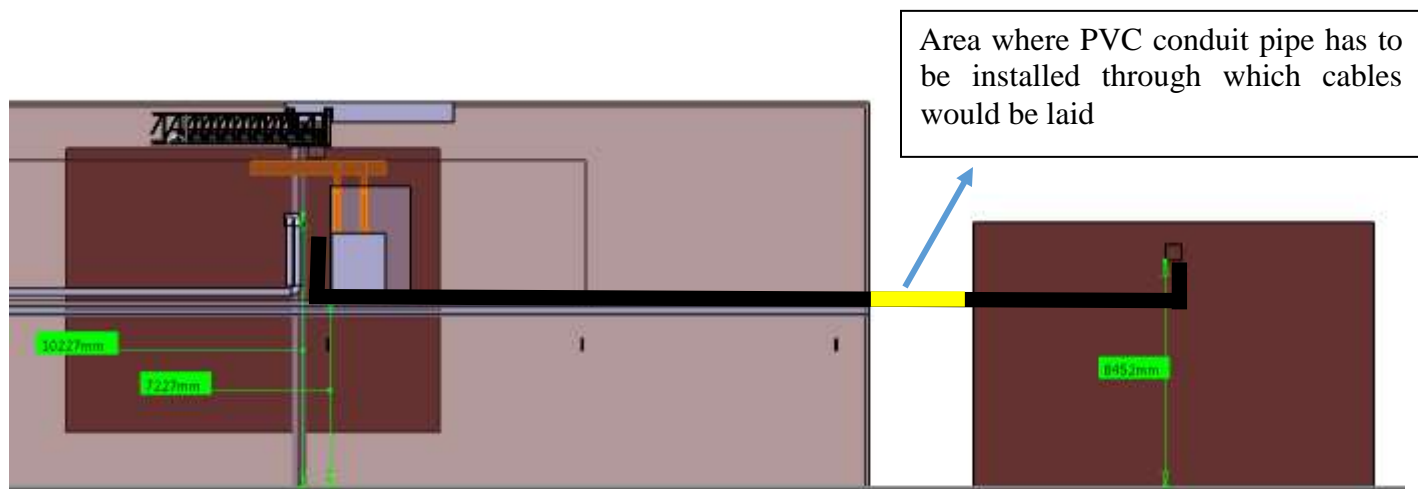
Elevation of Cable route highlighted in black from utility building outside to load distribution centre building. The portion highlighted in light grey is the region where PVC conduit pipe/Cable tray has to be installed through which cables would be laid.
